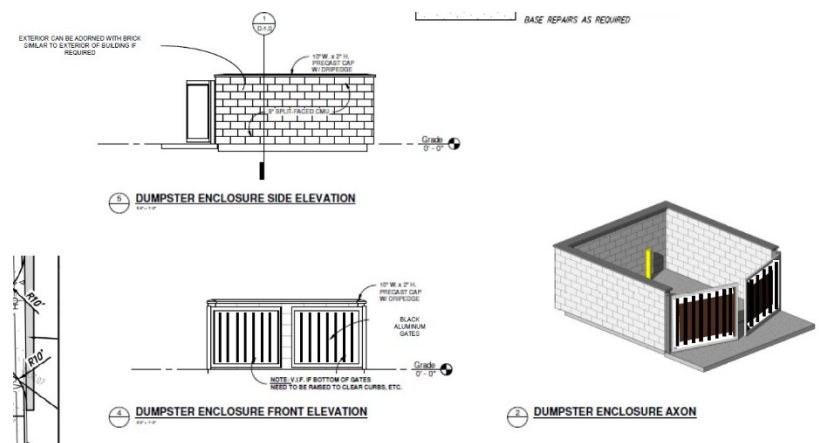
, by applicant: Dumpster enclosure elevations and axonometric showing CMU wall with option to add brick cladding to match the building (optional) and aluminum gate.
